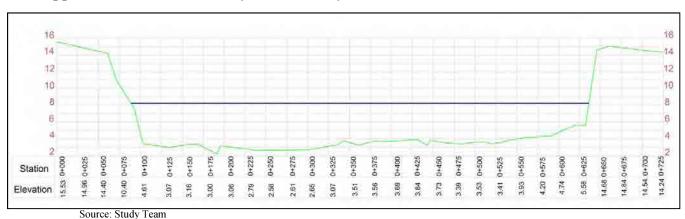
River Cross Section of the Alternative Bridge Locations B-1
